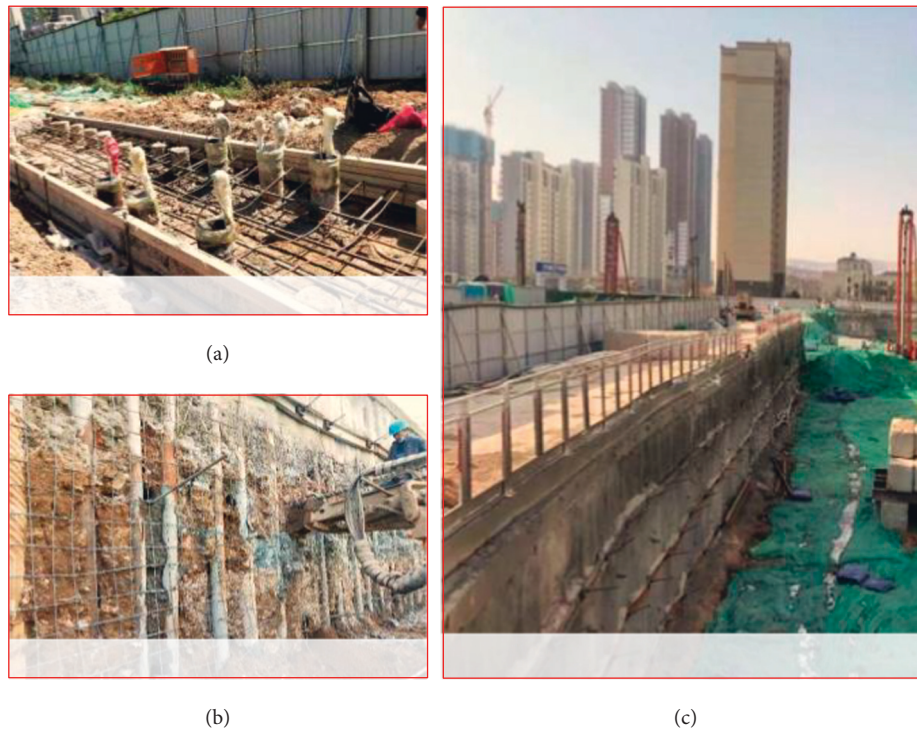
Double row steel pipe pile composite support construction process. (a) Micropiles and capping beam. (b) Anchor construction. (c) Excavation completed.
